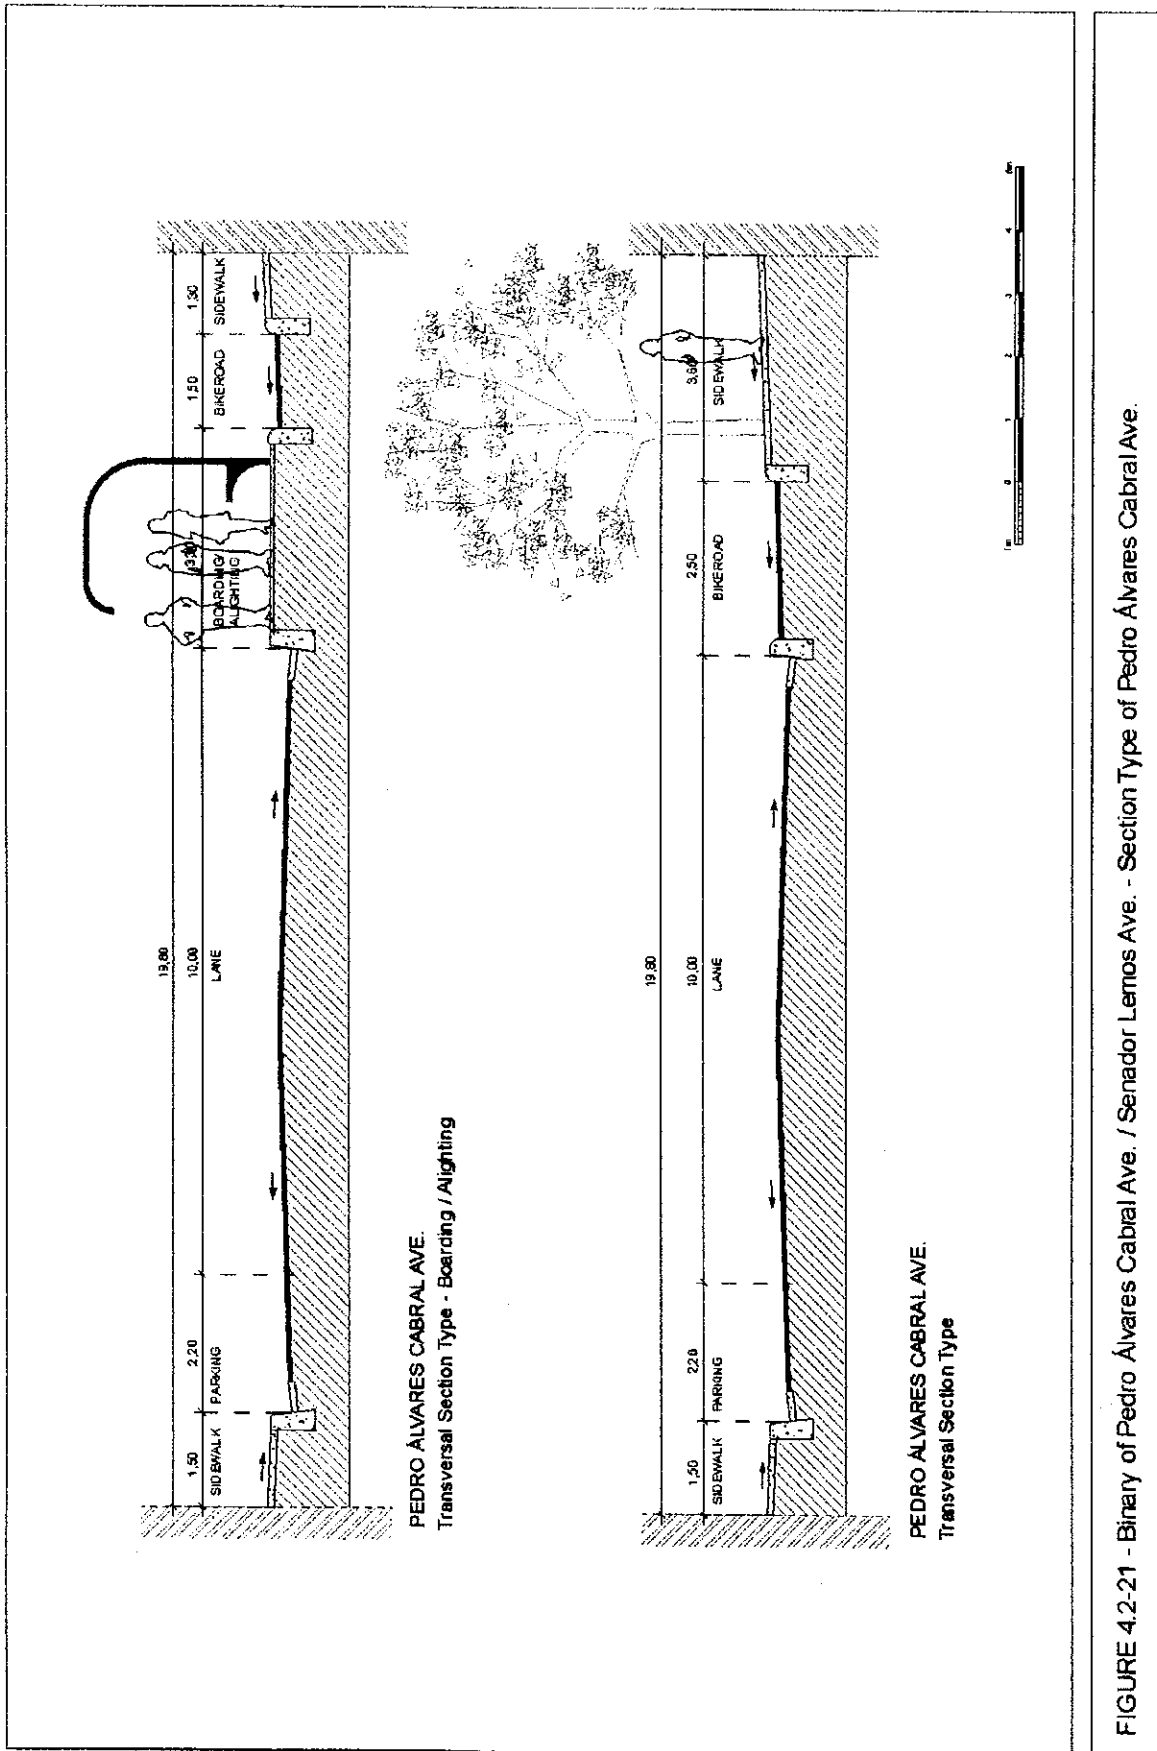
Binary of Pedro Álvares Cabral Ave. / Senador Lemos Ave. - Section Type of Pedro Álvares Cabral Ave.
